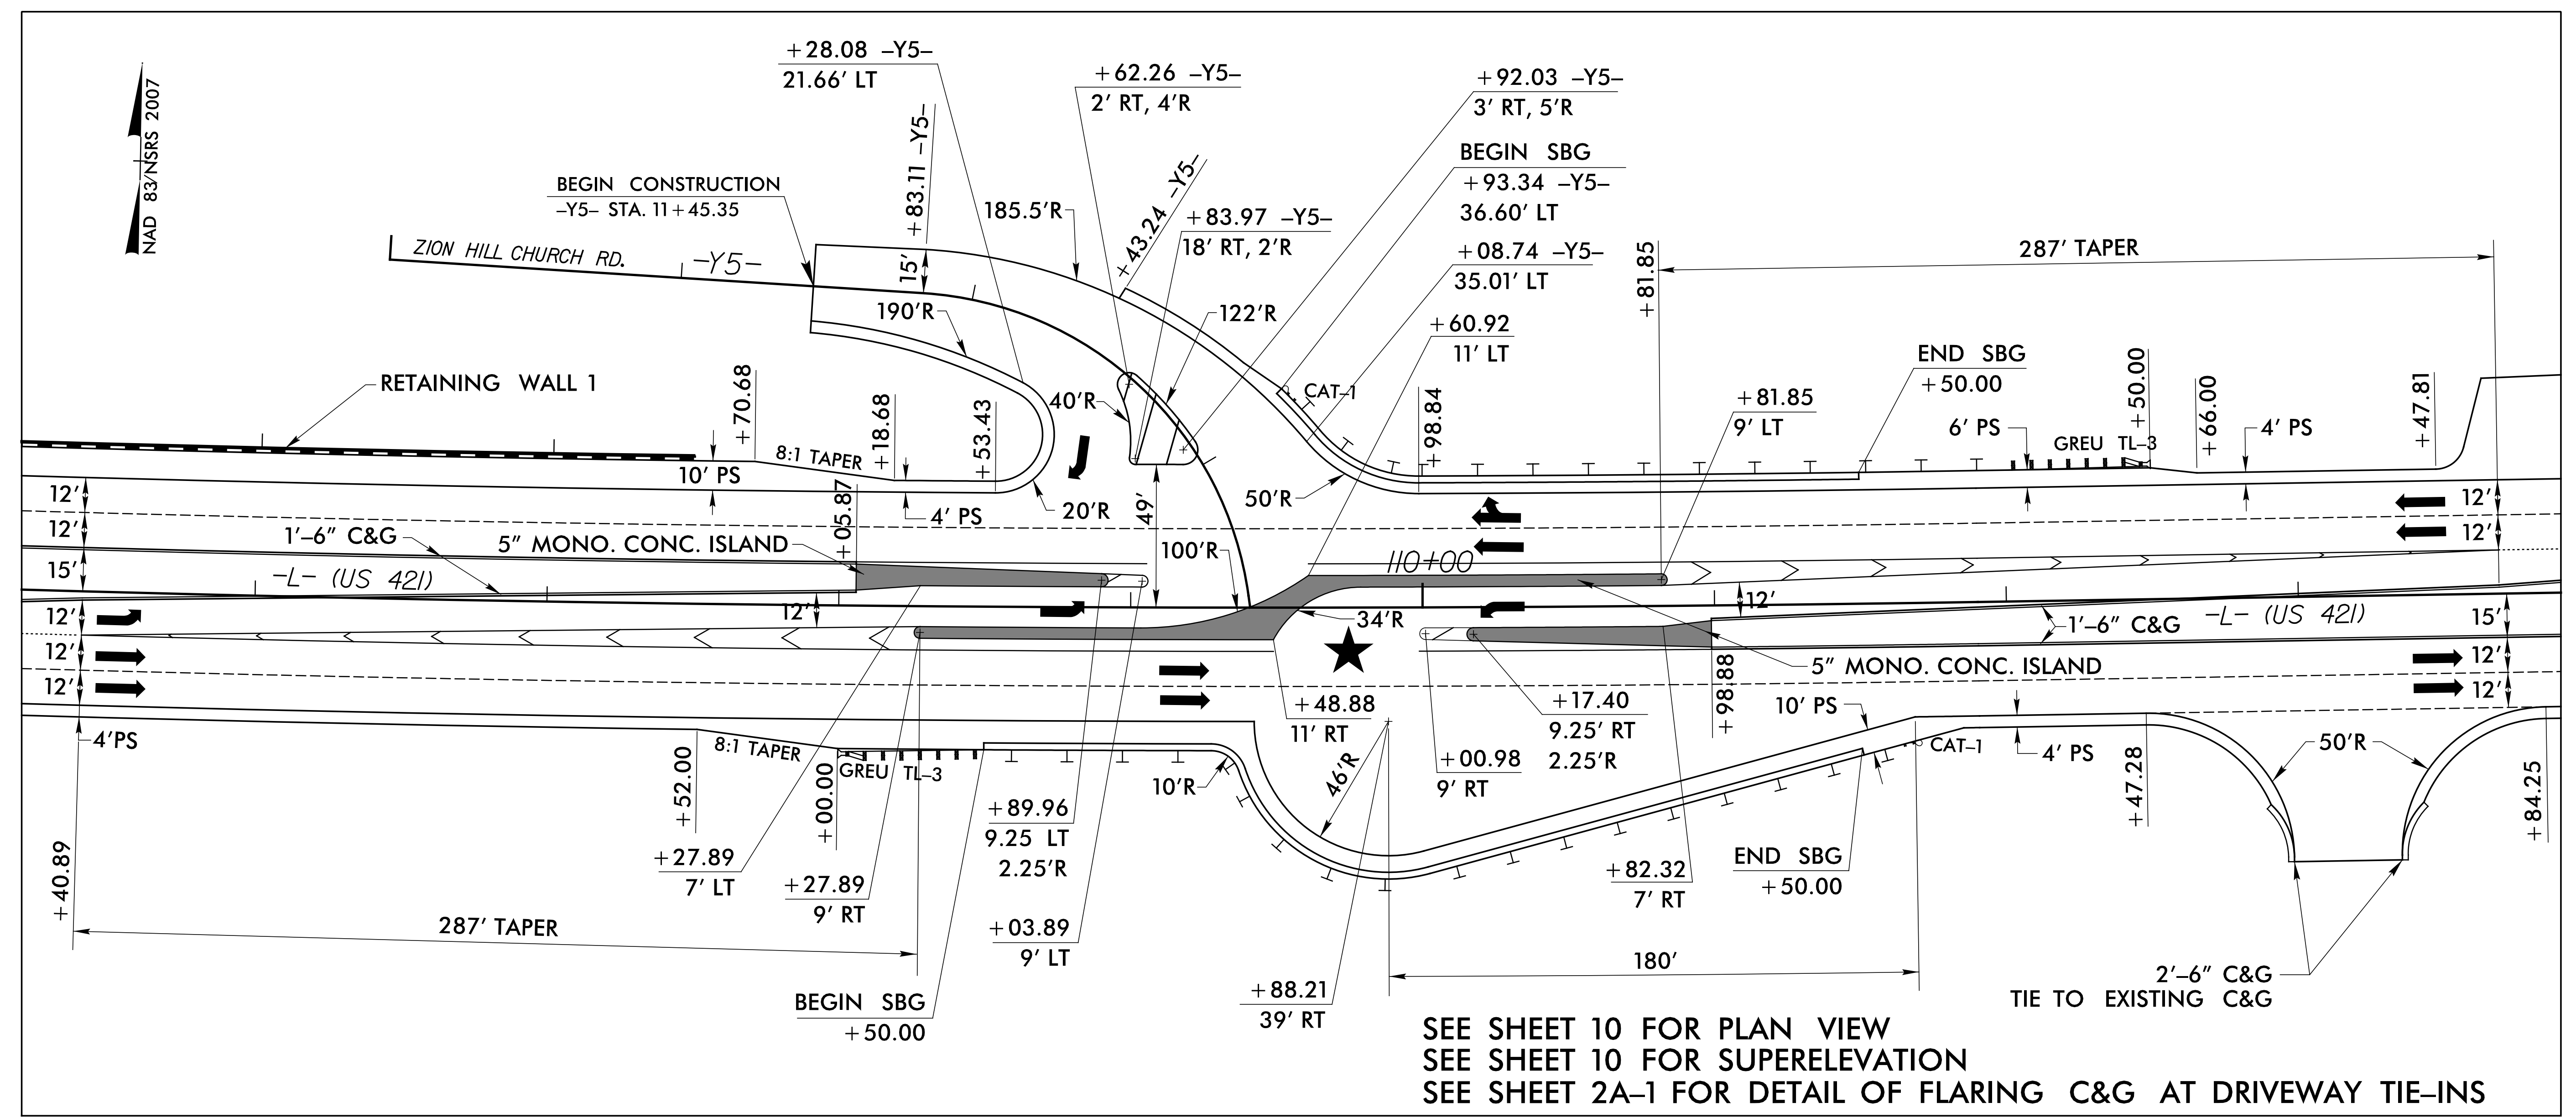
L- STA. 84 + 50.00 TO 93 + 40.00
